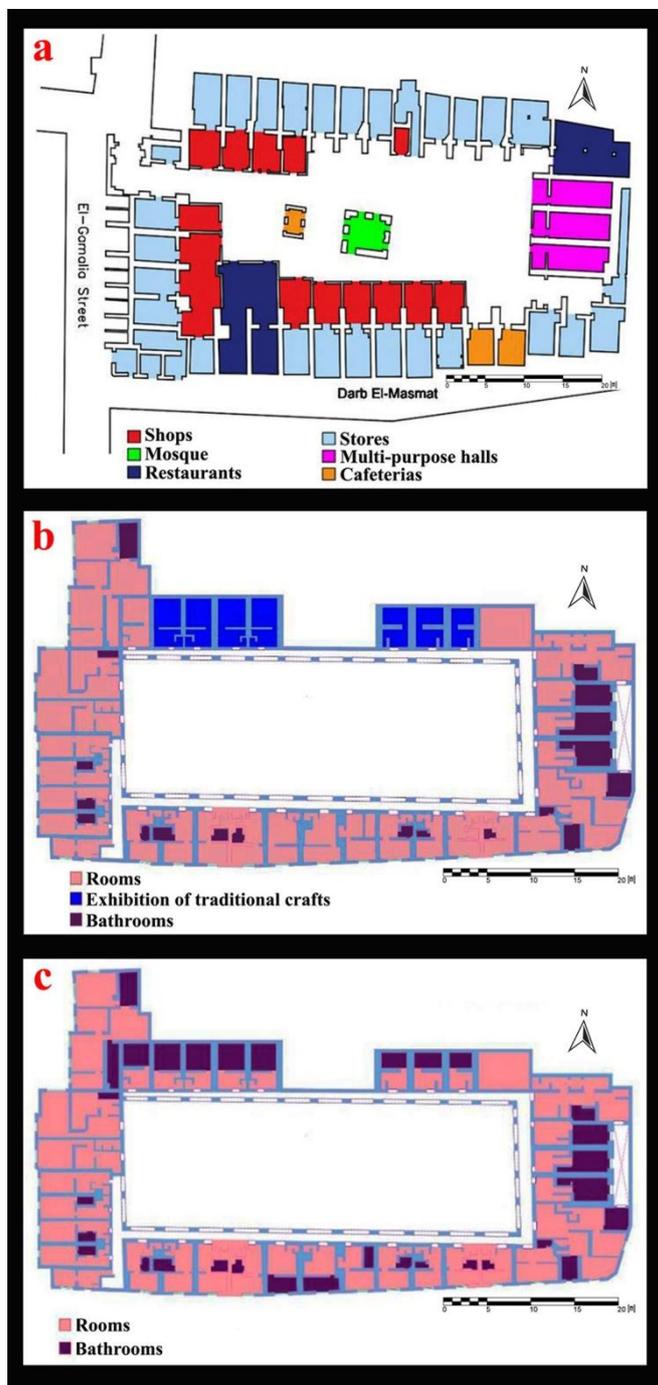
The proposed plans after reuse (a) Ground floor, (b) First floor, (c) Second floor
